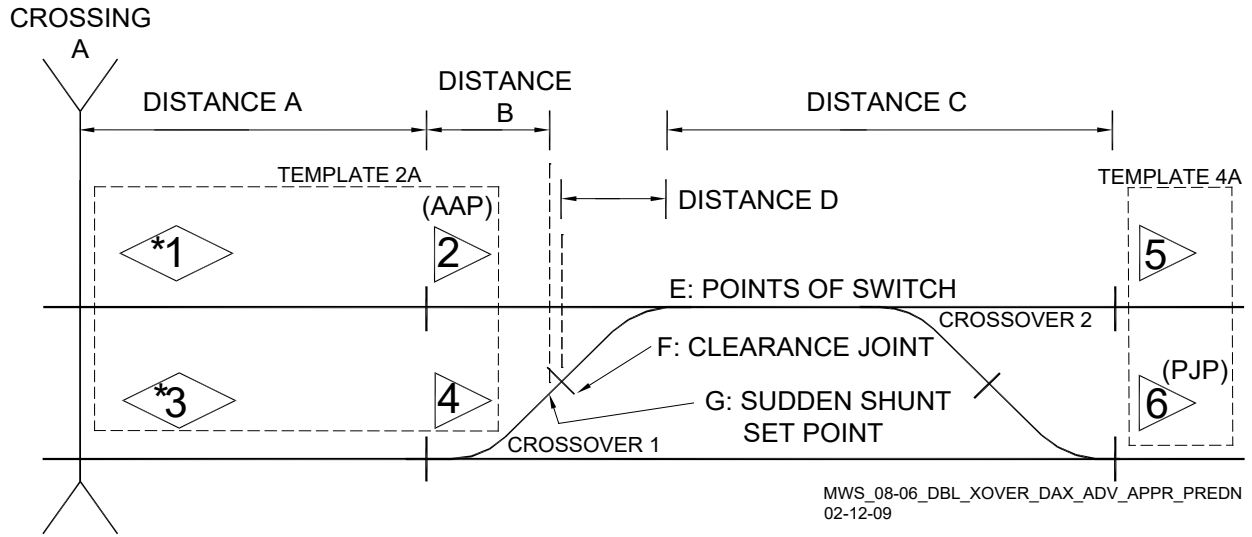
Remote Double Crossover Using Adv Appr Predn
